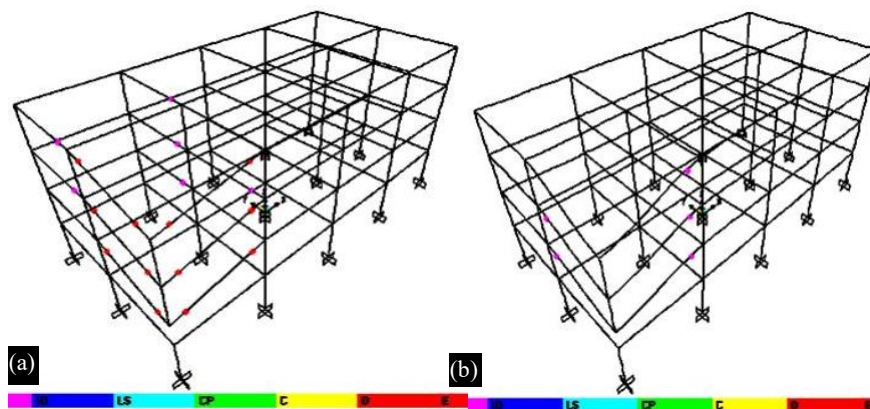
Deformed shape and hinge formation after removal of C3: (a) earlier section and (b) revised section.
